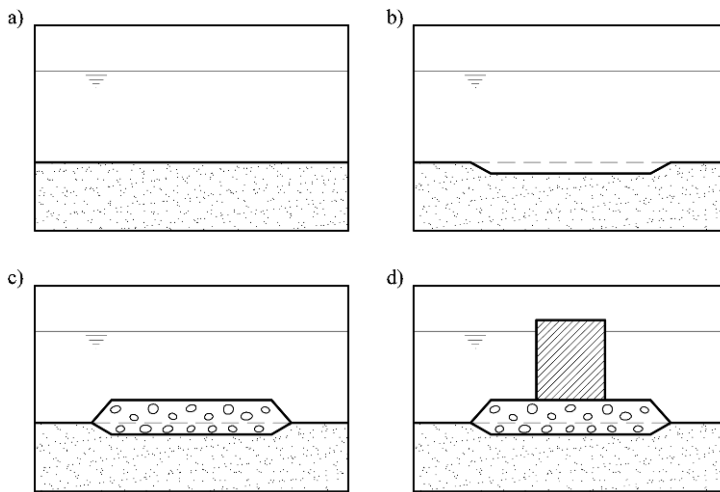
Caisson construction sequence: (a) initial soil conditions; (b) trench excavation; (c) extension of granular embankment; (d) caisson sinking.
